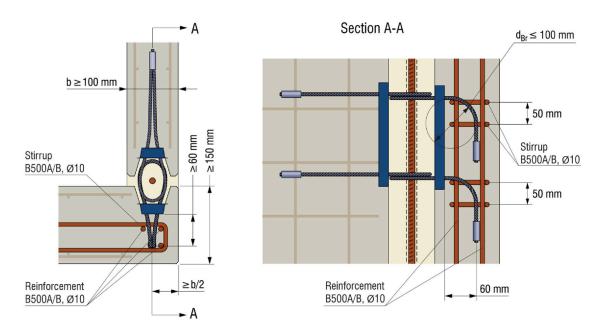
Wall - Wall - CORNER CONNECTION - detail with bended wire loops
